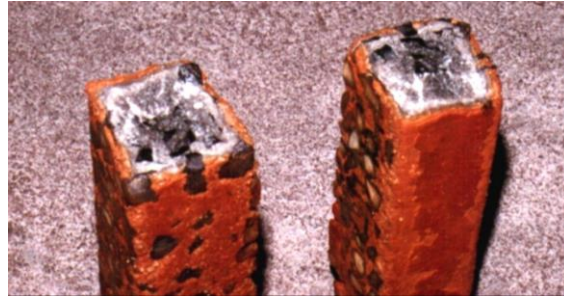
Fractured surfaces of test beams – pH 5.0, 24 years
